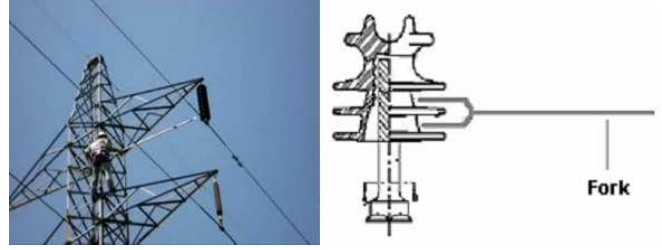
(a) Fork test; Fig. 5. (b) Drawing
